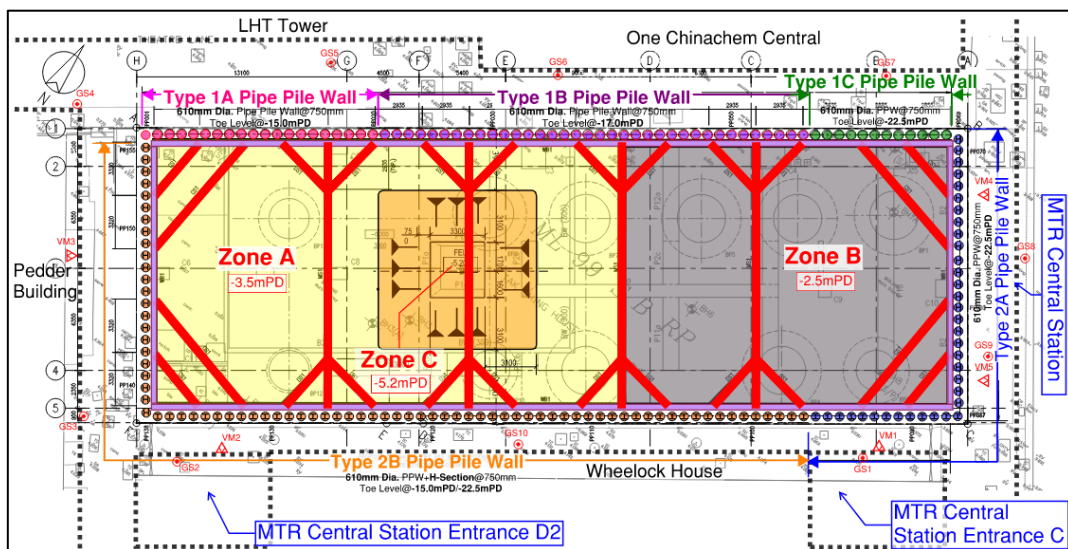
Proposed ELS Scheme – 610mm dia. Pipe Pile Wall and Three Layers of Struts
